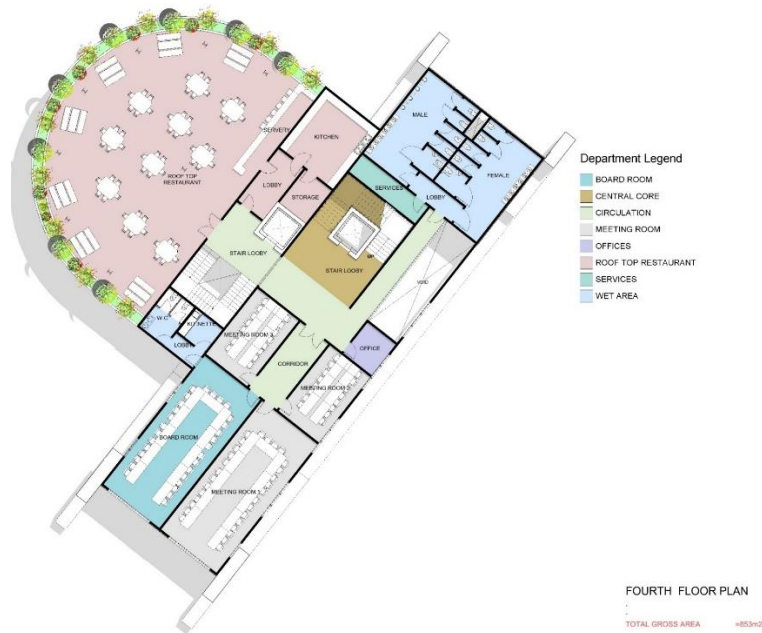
Multi-purpose Educational Complex Fourth floor layout
